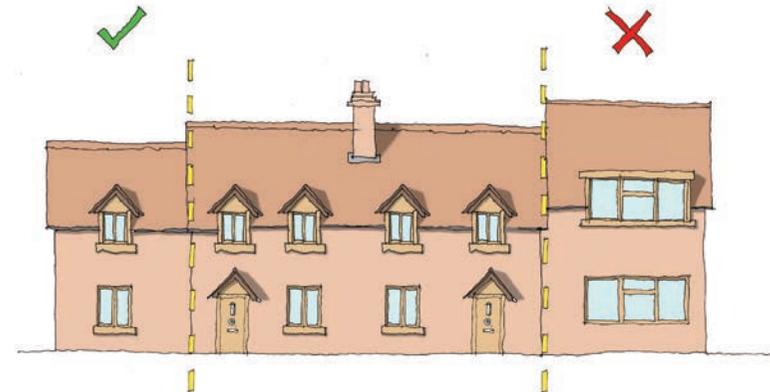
Keeping the ridge and eaves of an extension lower than the main building and maintaining the same roof pitch will help the original house maintain its dominance.
